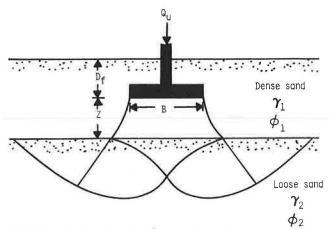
Failure in soil under a continuous foundation.
